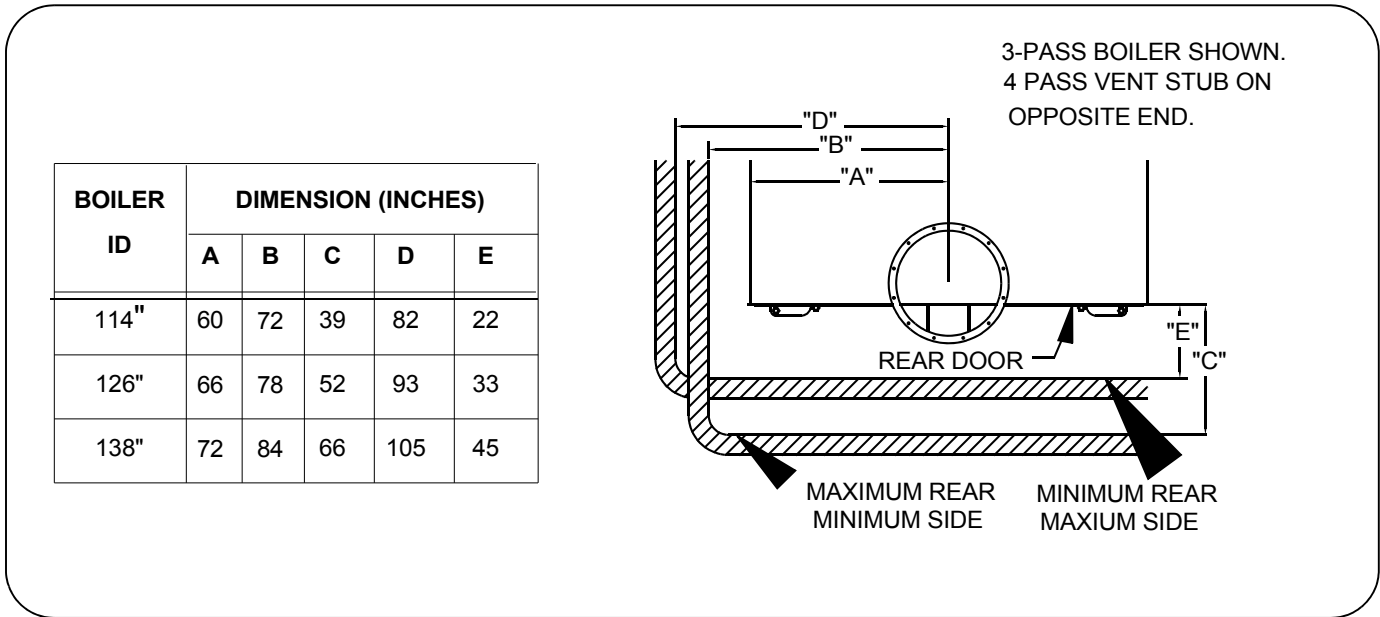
Space Required to Open Rear Doors on CBL Boilers
